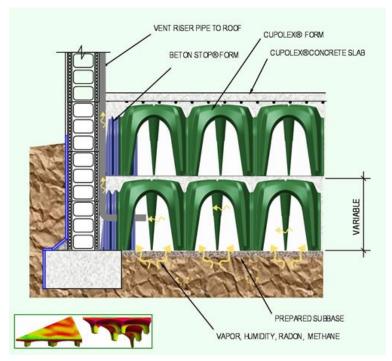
IGLU Form work system with 2 layers, extracted from (<u>www.cupolex.ca</u>)
